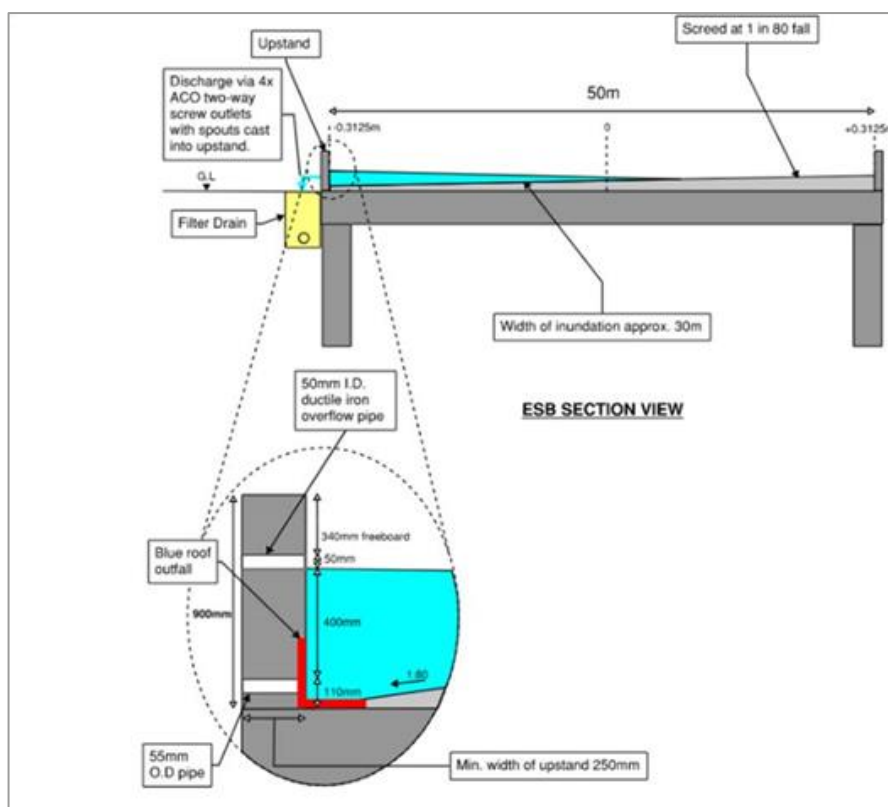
A cross section of the proposed Scissor Box 'blue roof'
